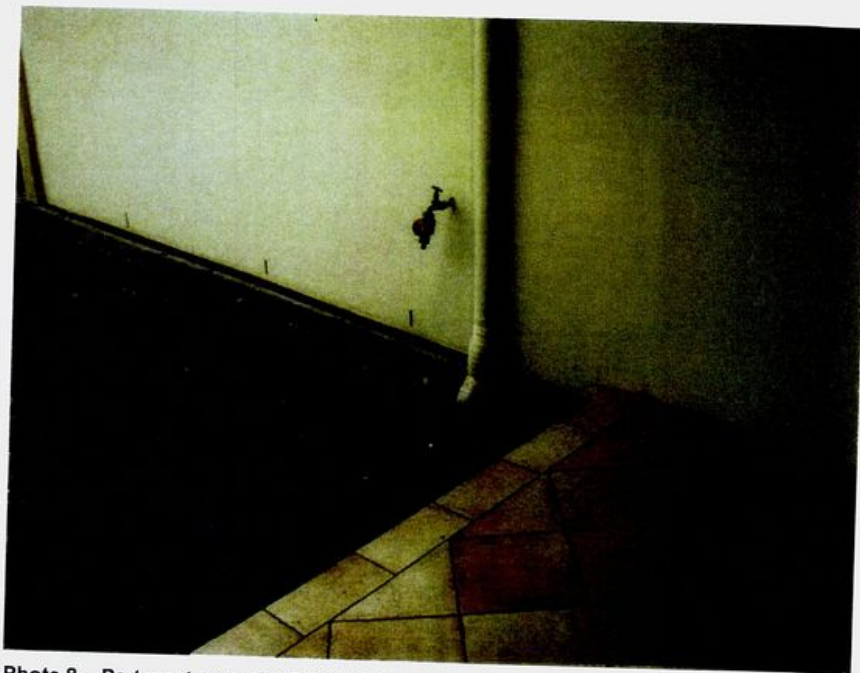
Part western wall of the rumpus room showing the junction of the tiled surface of the verandah is above the 1 course set down of the slab edge and for all intents and purposes is flush with the interior slab surface
